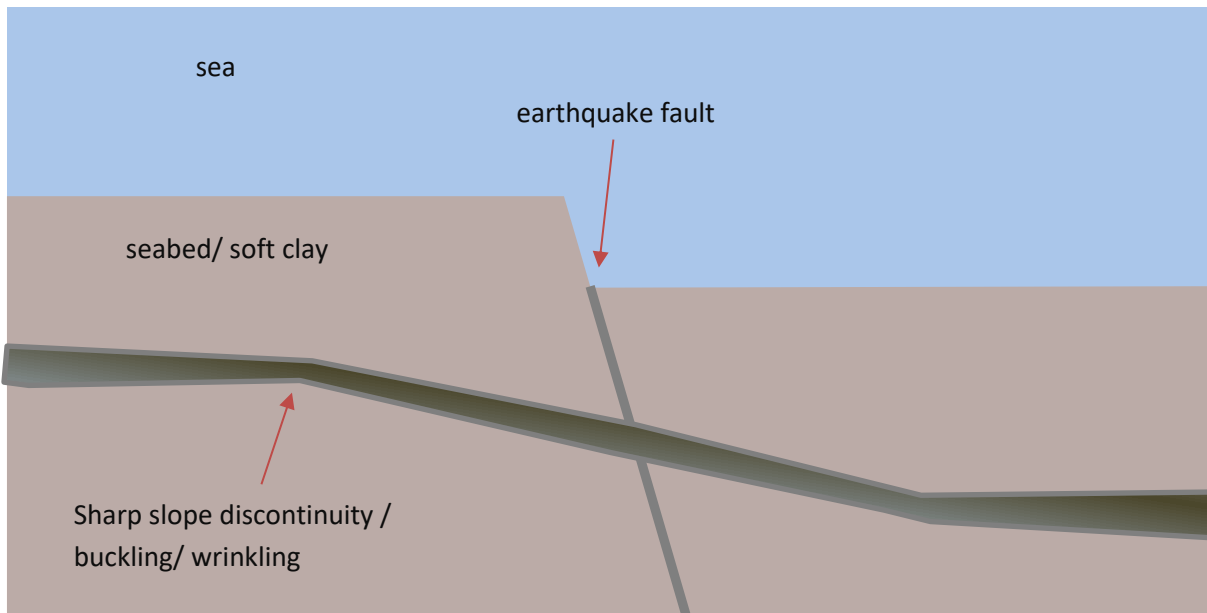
Schematic diagram of a single-wall seafloor pipeline failure at earthquake fault plane
